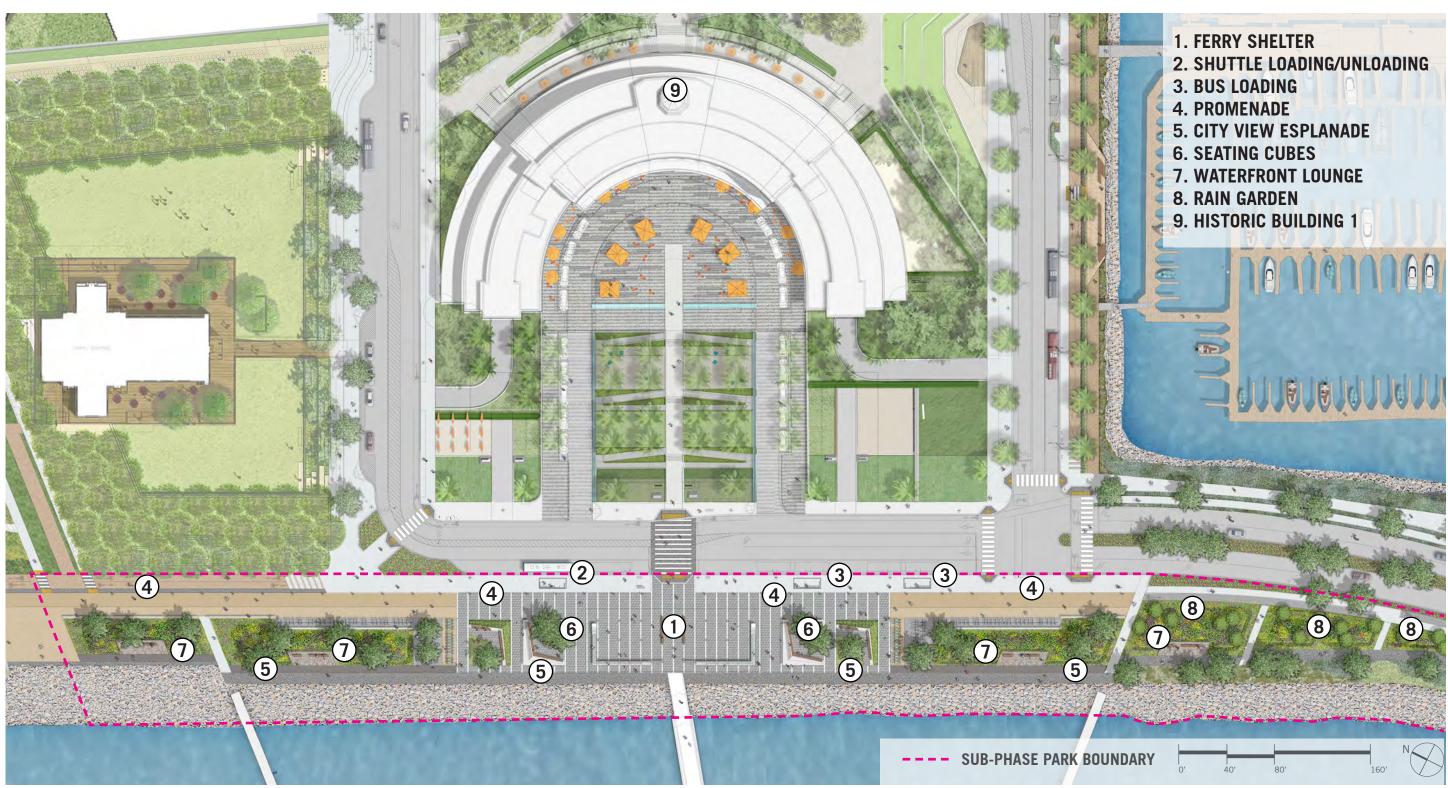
WATERFRONT PLAZA ILLUSTRATIVE PLAN
